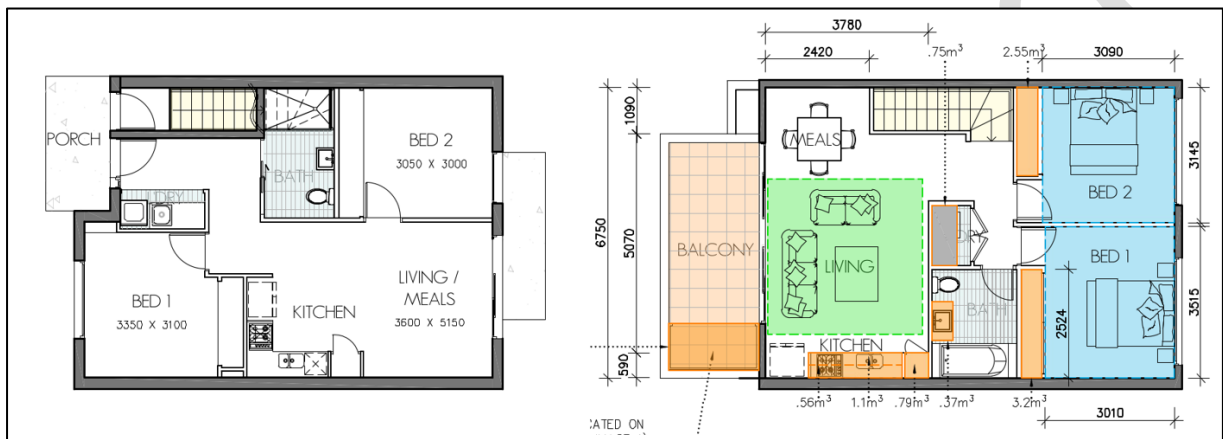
Layout A Courtyard ground floor plan (left) and Layout A Terrace upper storey floor plan (right). Source: Application documents.
